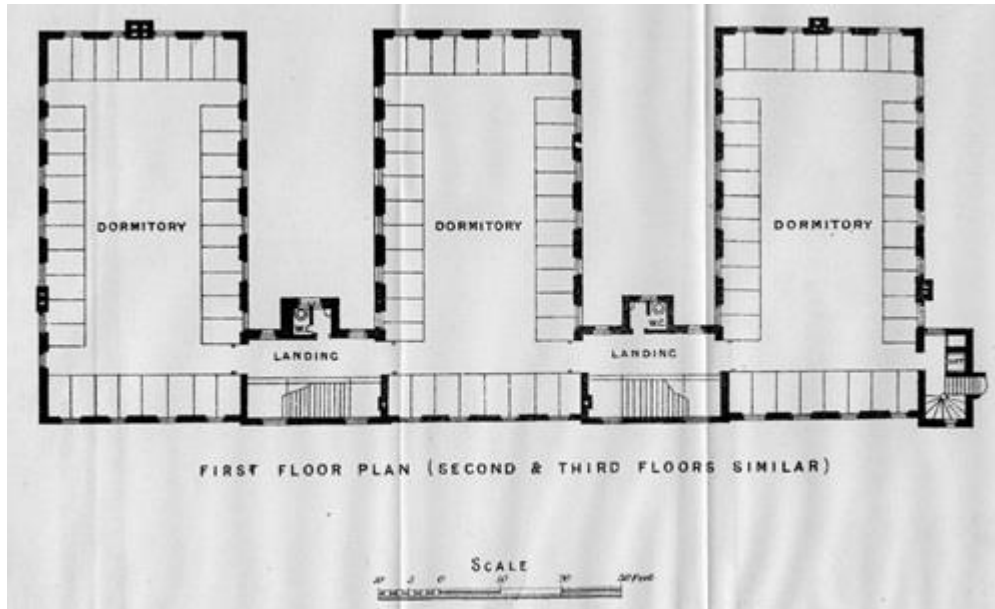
Parker Street Lodging House, upper accommodation floors (LMA ref: LCC/AR/HS/03/059)
